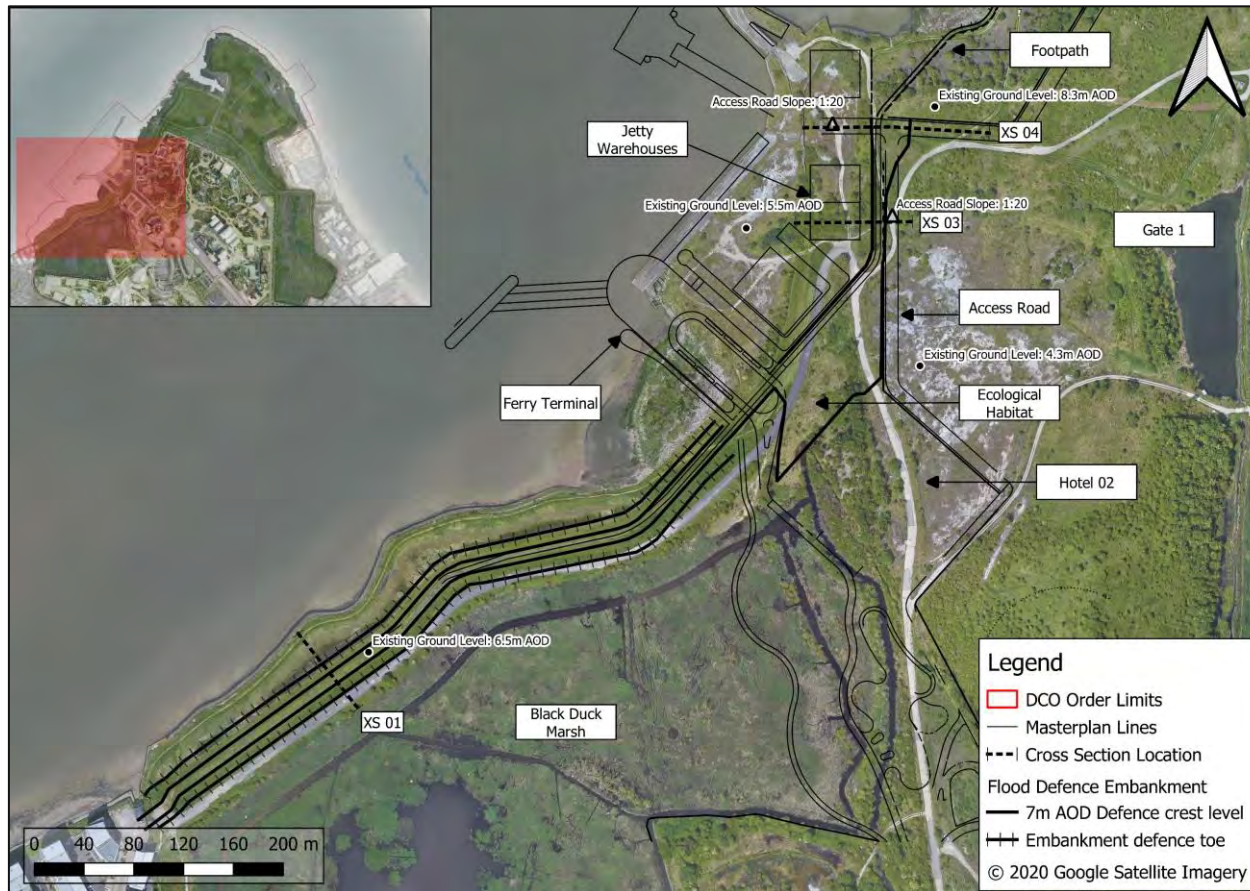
Spatial plan of showing indicative location of proposed flood defence crest, toe and raised land levels against existing satellite imagery. This is to achieve recommended TE2100 Plan flood defence SoP to 2070.
